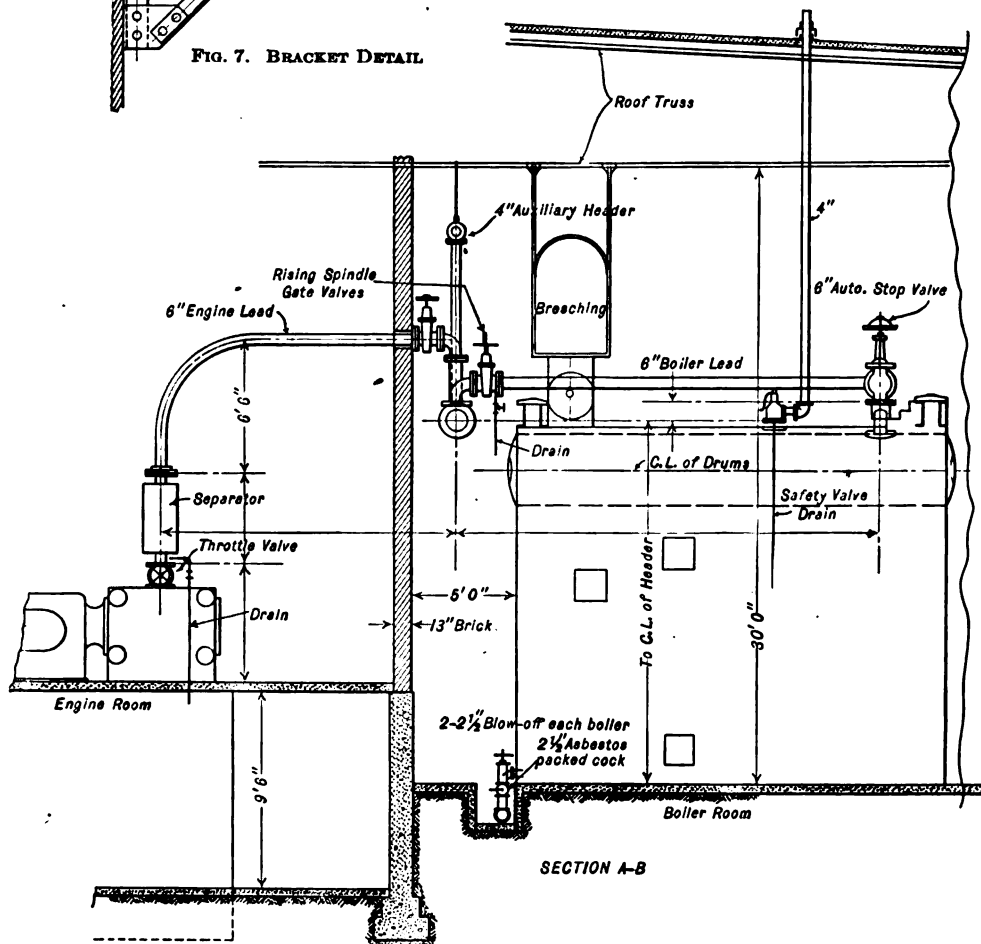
CROSS-SECTION ELEVATION FOR SINGLE-HEADER SYSTEM.
